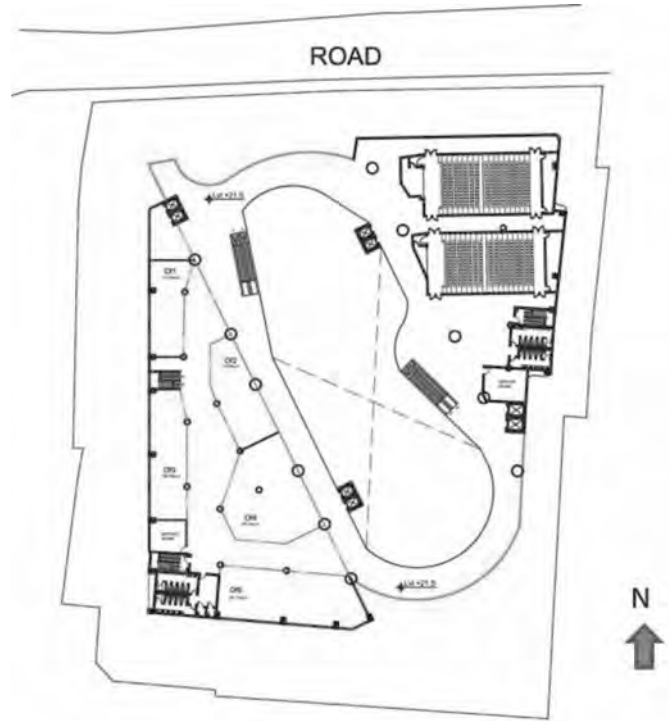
Fifth floor plan showing the layout of offices and multiplexes.
